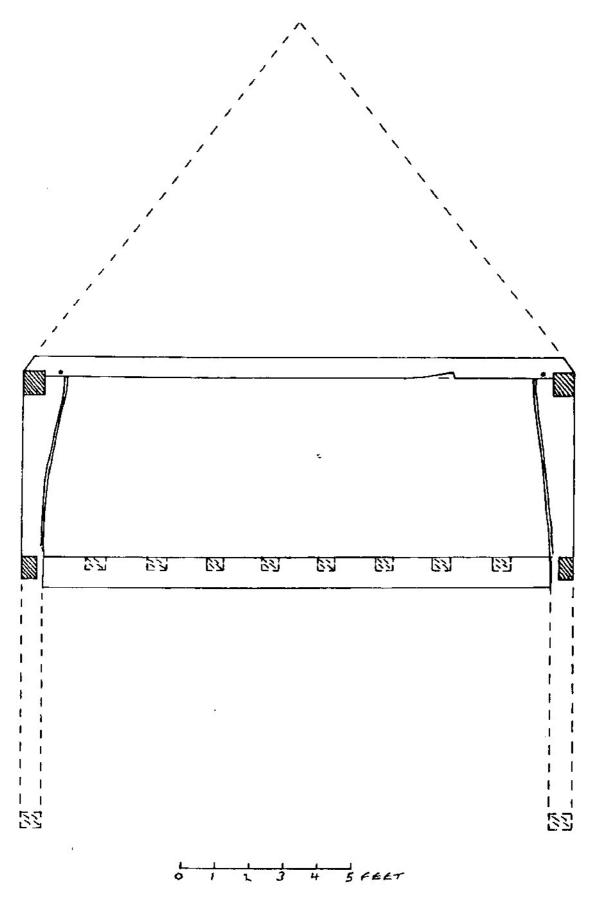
Mascotts, Copford: Inline Structure, Central Truss
